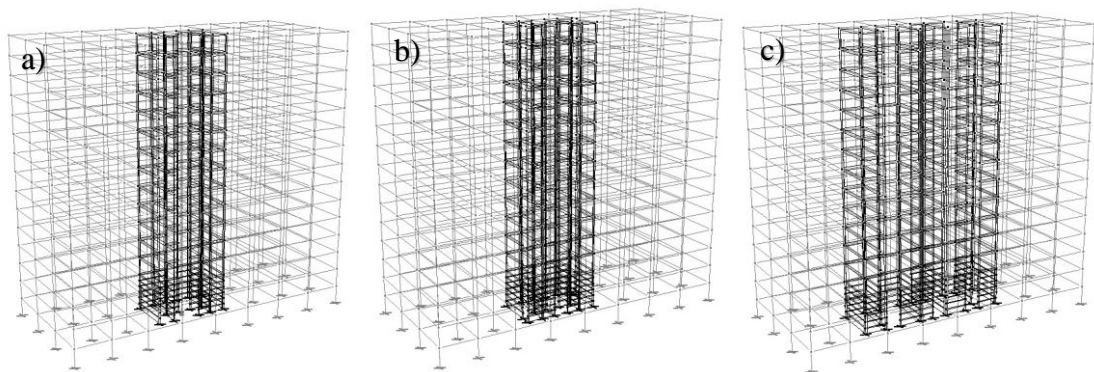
Analytical structural models of the first group buildings in Perform 3D. (a) Building 1A, (b) Building 1B and (c) Building 1C
